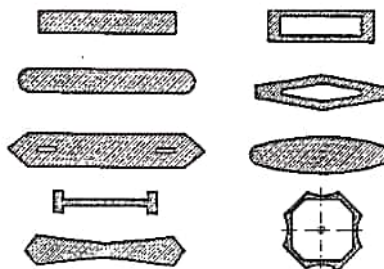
Typical cross-section shapes of piers for river and waterway crossings.
